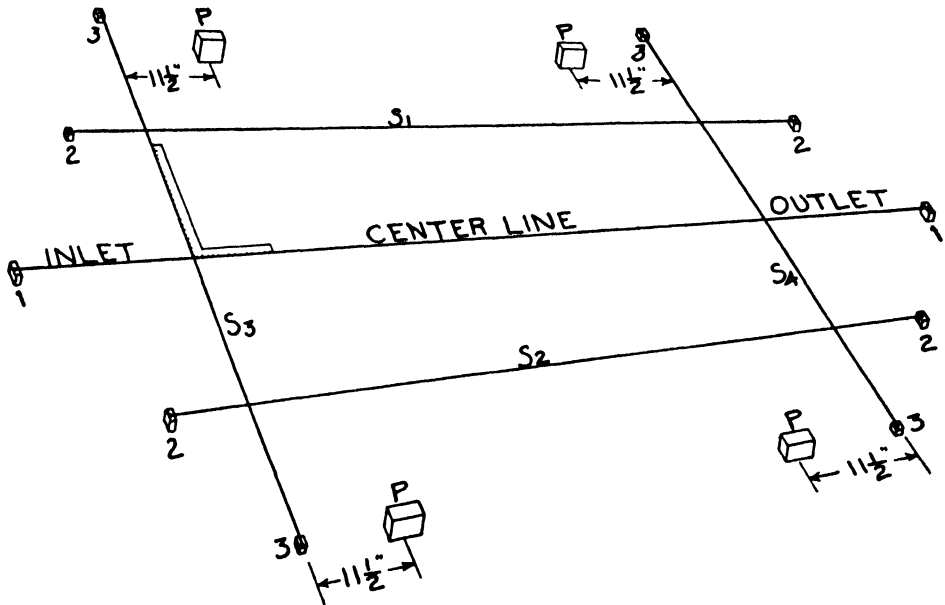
An illustration of how to lay out a pit for a septic tank. All stakes should be driven before digging is started to avoid cave-ins.
